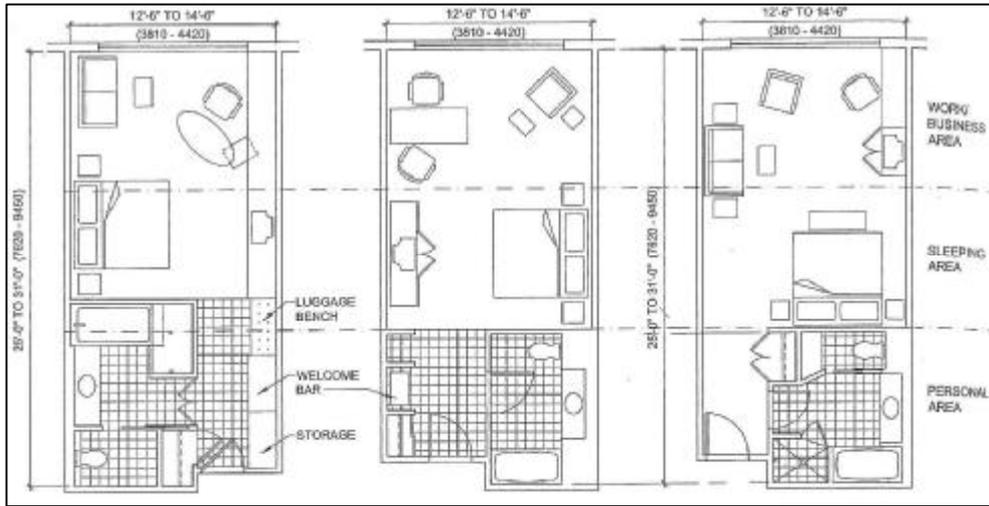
Configurations for typical hotel guestrooms. (McGOWAN and KRUSE, 2004, 378).
